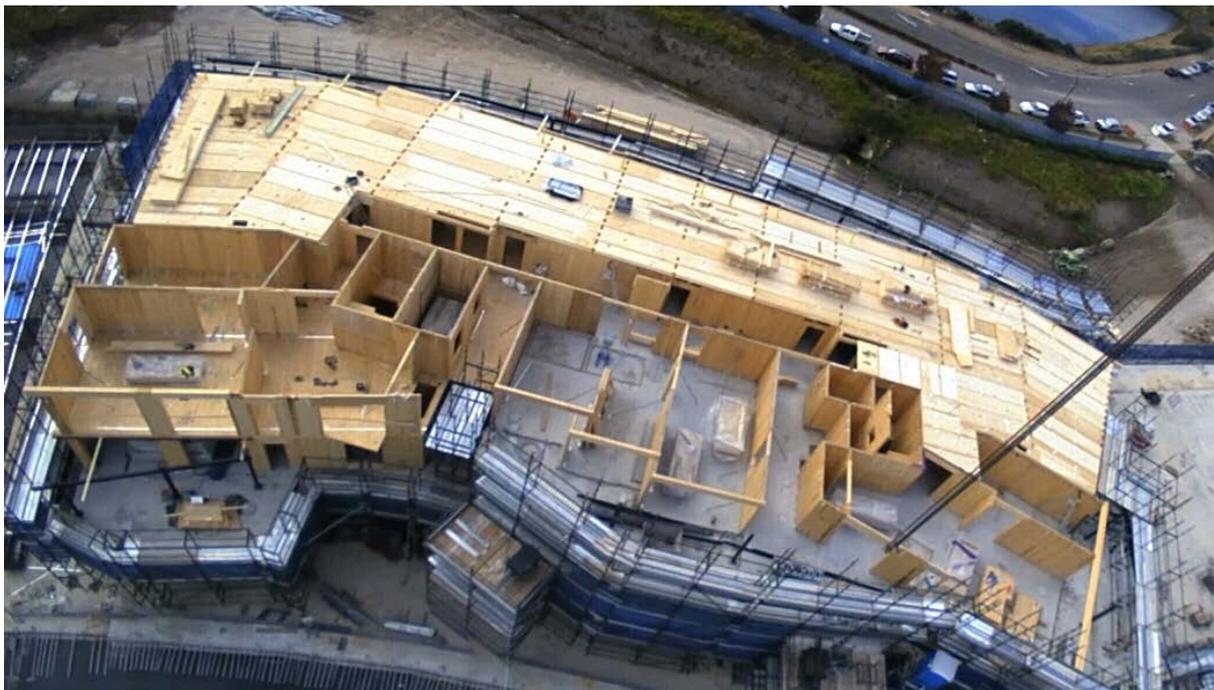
Beams across openings in the apartment layout (Note: significant usage of beams also occurred in the balcony construction albeit not shown in this picture)
